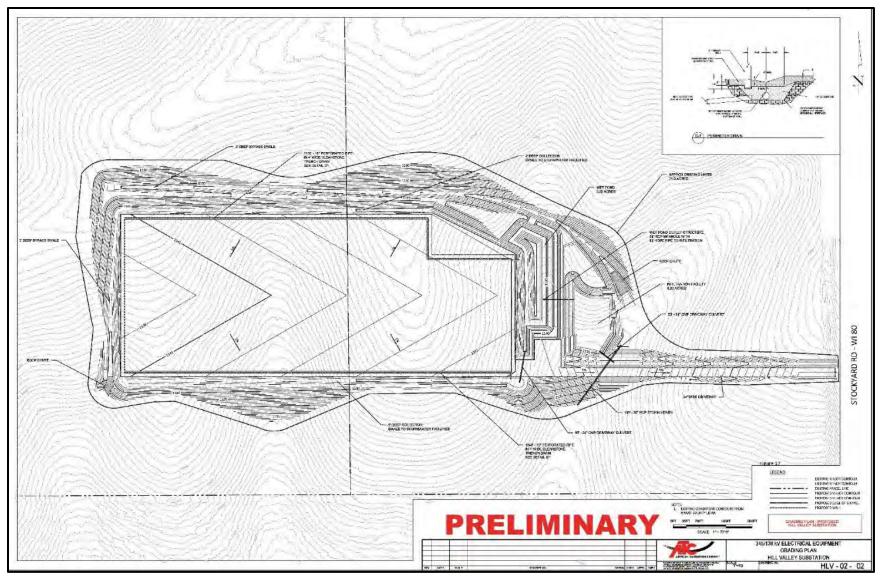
Preliminary grading plan for the Hill Valley Substation.
